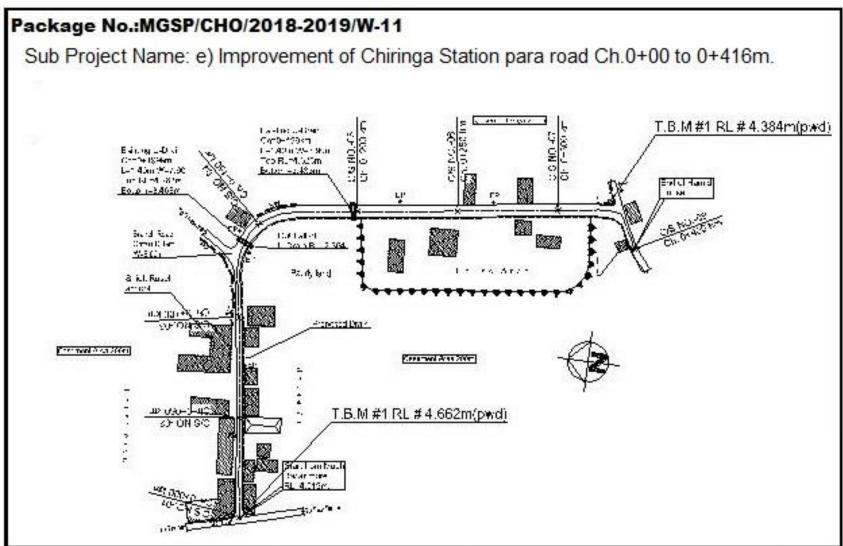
(e): Layout Plan of the proposed Subproject Road at Chiringa Station para road
